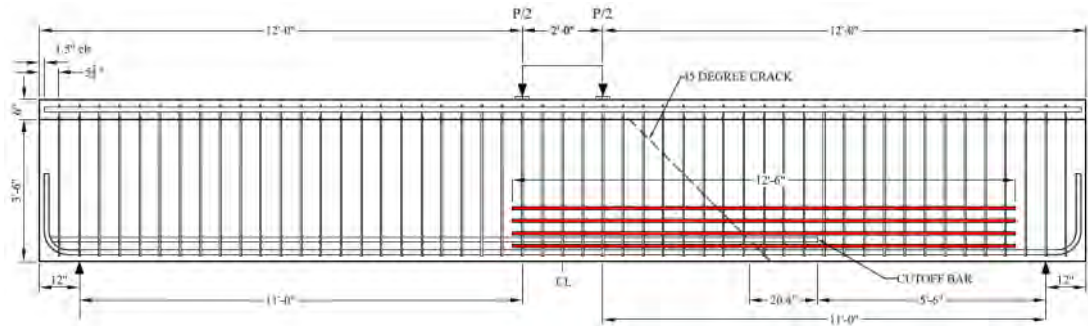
Elevation of specimen T.45.Ld3(6).SS.
